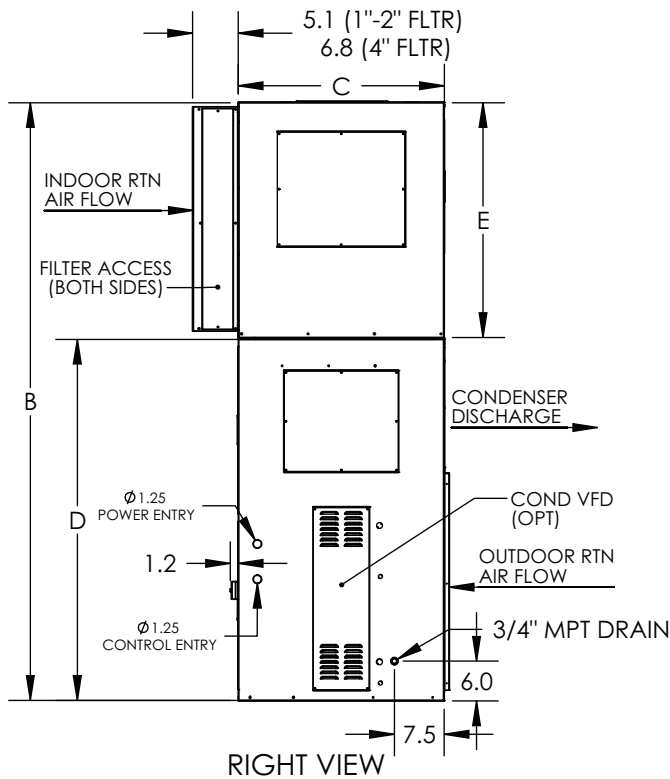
Base Unit Dimensions — 50XCA12,14 (Rear Return, Horizontal Discharge)
